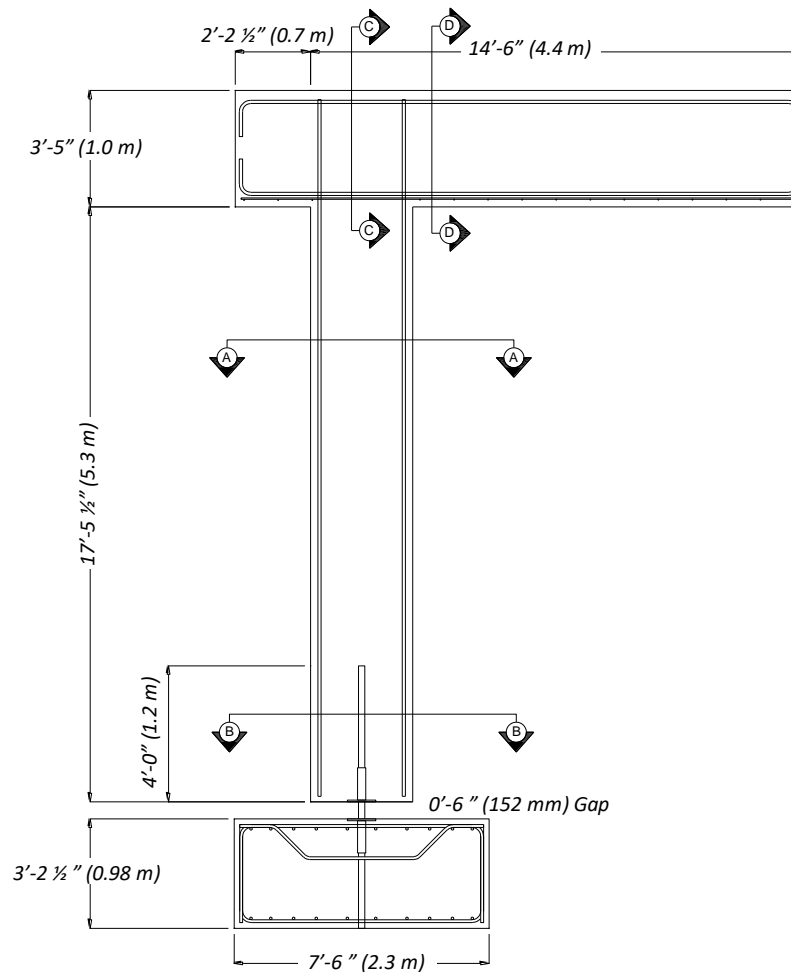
General Dimensions of Test Specimen (Elevation View)
